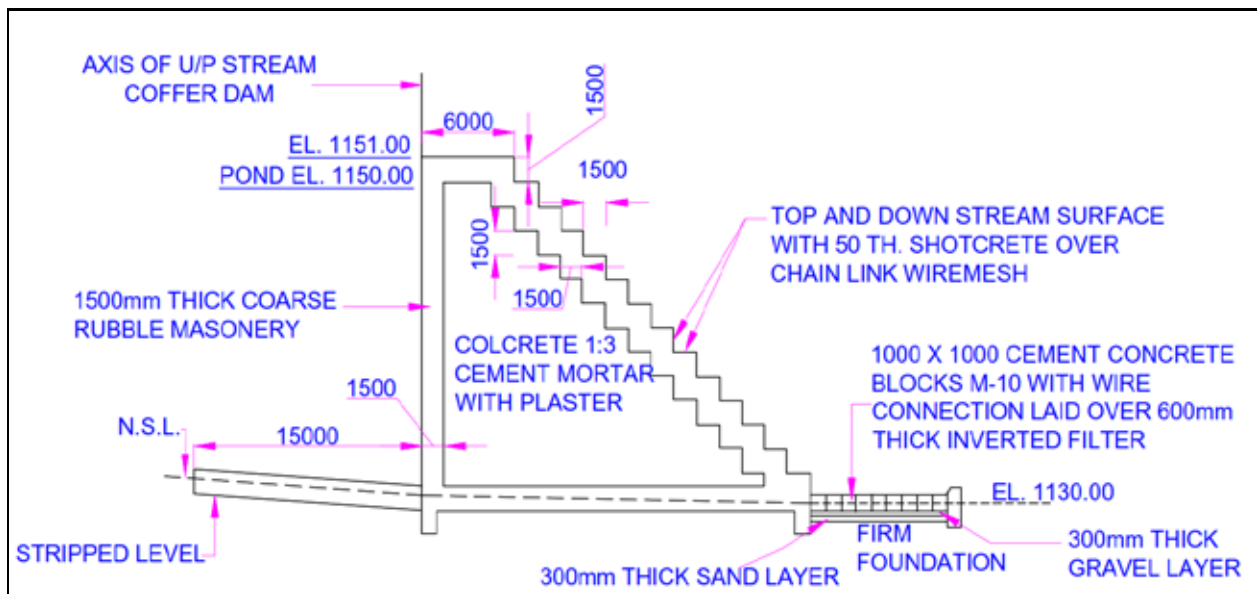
Maximum section of Upstream Coffor Dam (Colcrete)
